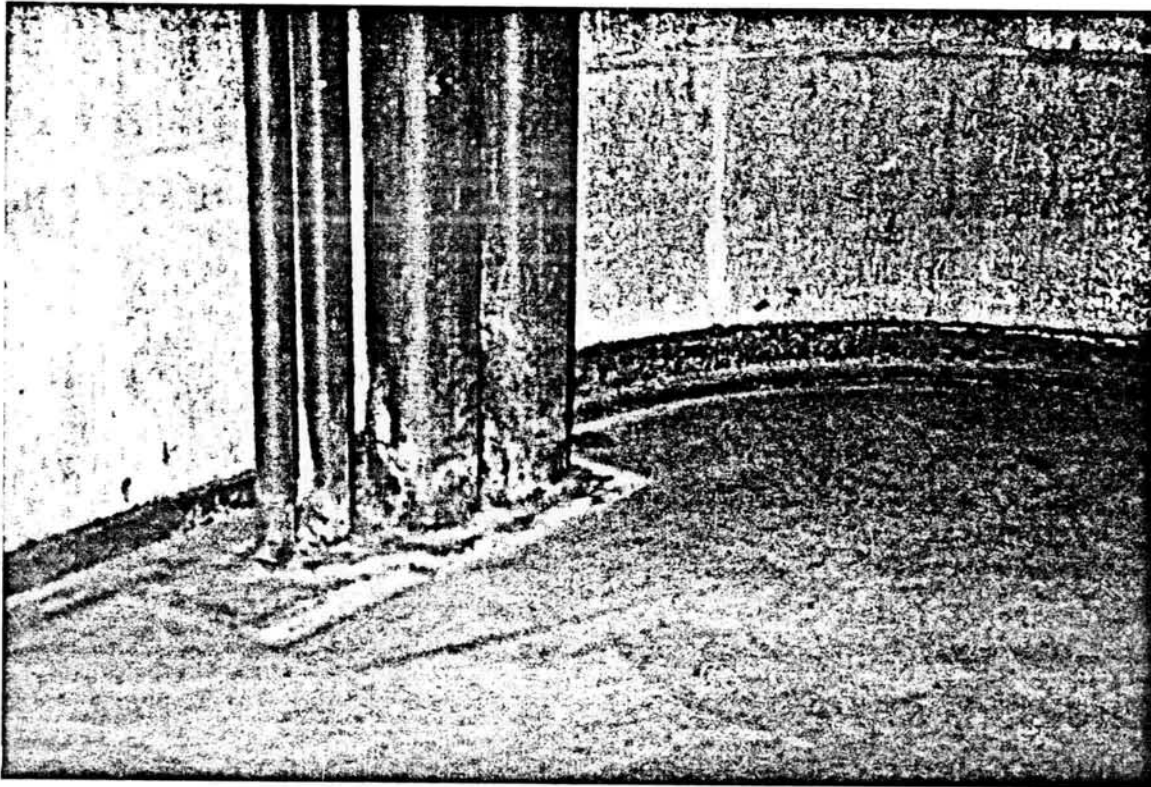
Conduits penetrating the landing at the northeast corner. Corrosion at the four conduits, at the metal plate which holds the conduits and at the angle against the wall is typical at all the landings.
